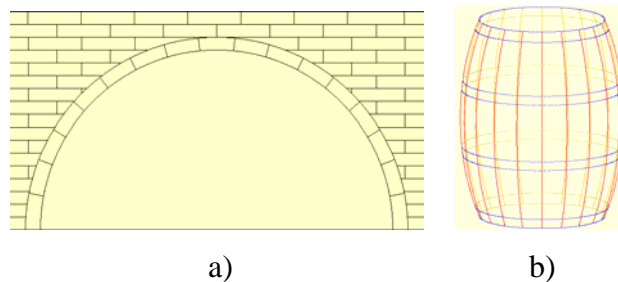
a) Masonry arch; b) Wooden Barrel
